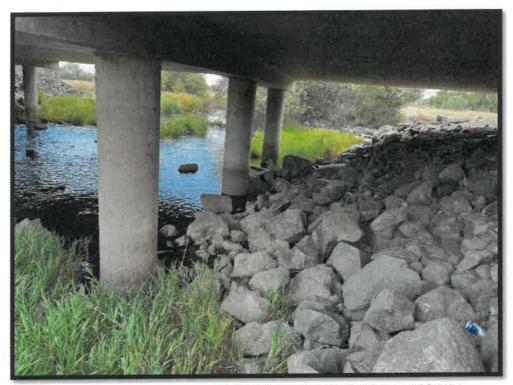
Rip rap beneath EB Wilson Creek bridge. Note submerged pier columns and OHWM.
